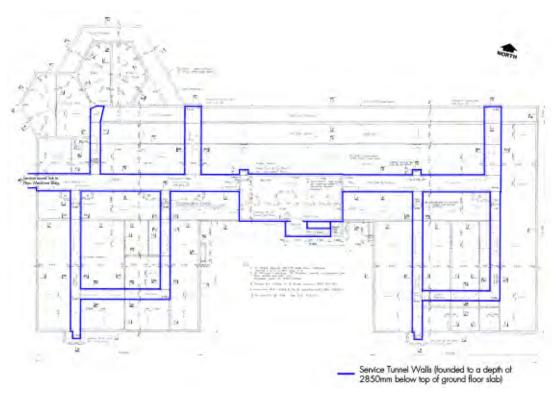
Spinal Injuries Unit – Basement/Foundation Plan
